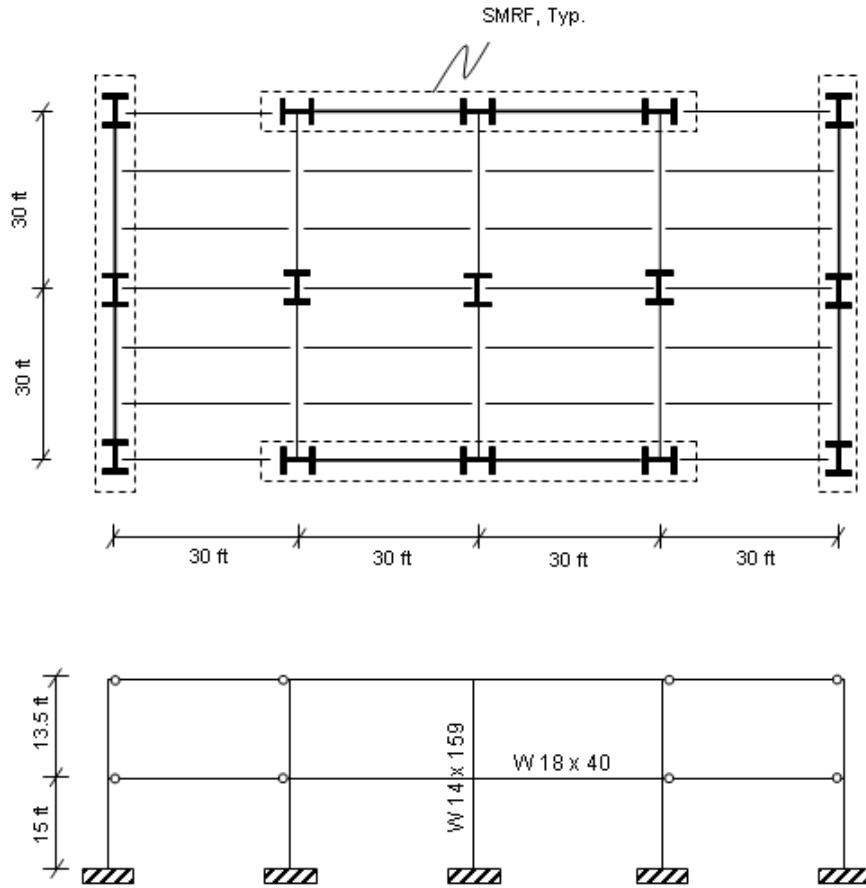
Plan view of the structure considered and an elevation of the SMRF
